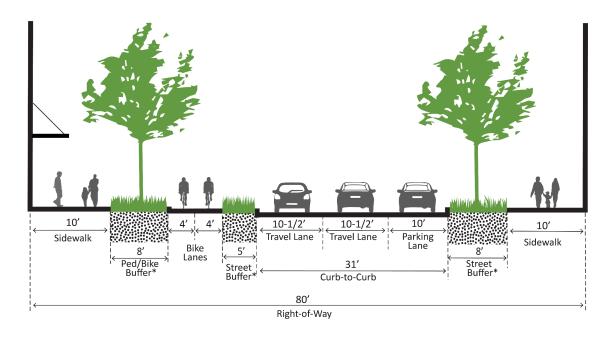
Cameron Street (B-28): 2nd Avenue to Georgia Avenue, Looking East
